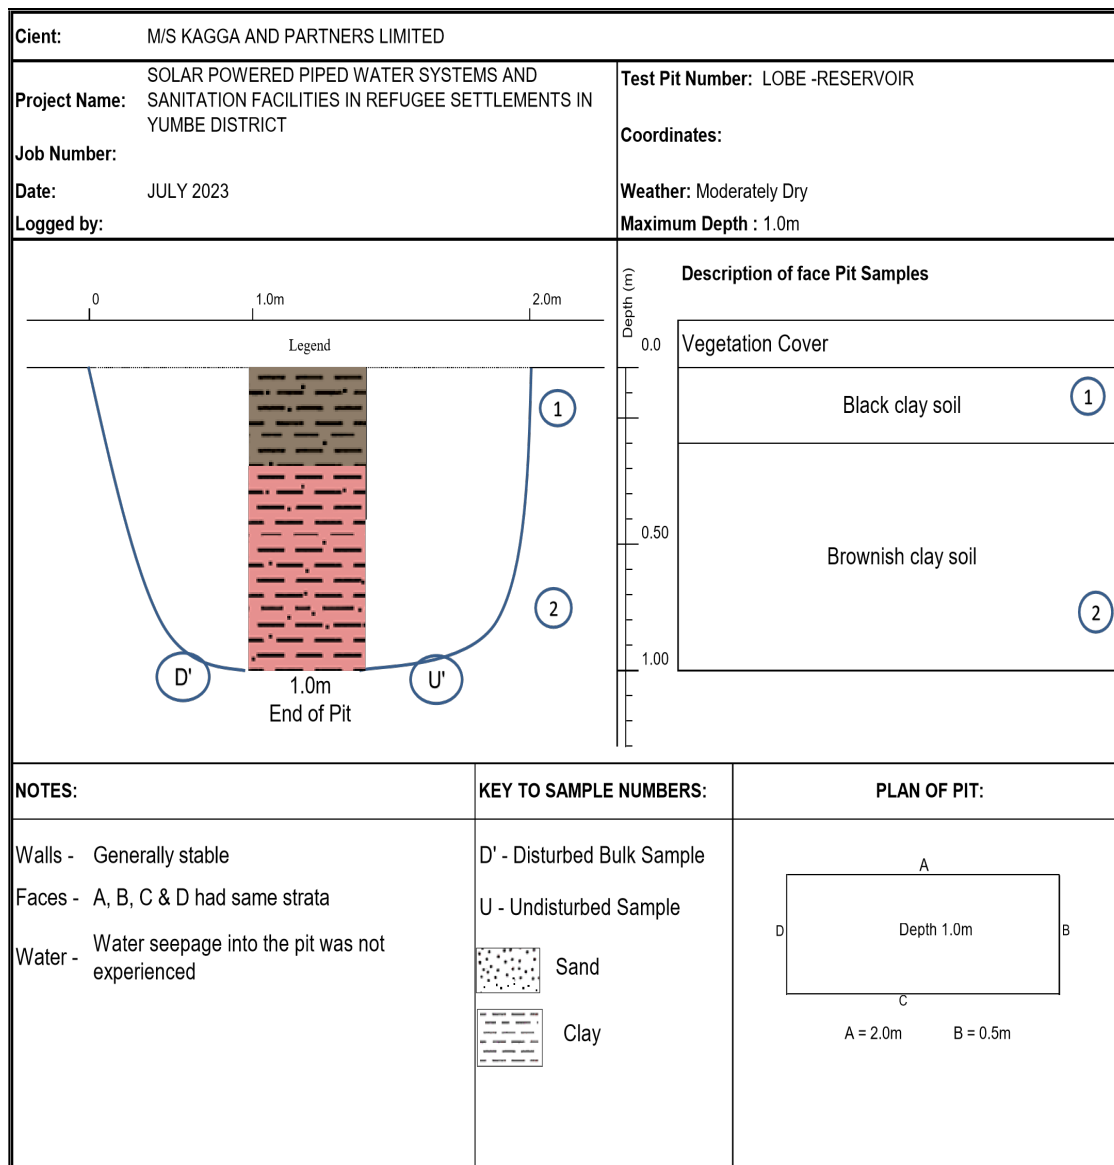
Trial Pit No.2 Log (Soil Profile): Reservoir Site (Kaaga and Partners-Design Engineer,2023)
